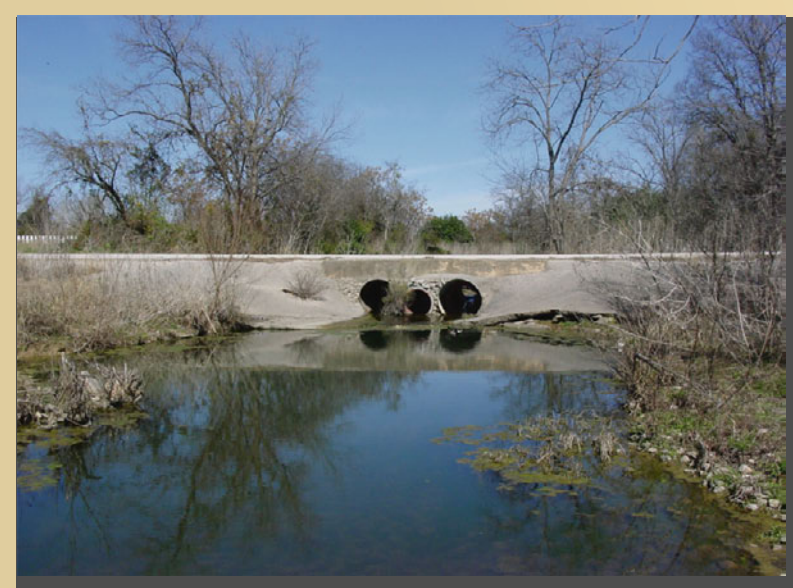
Looking upstream at Yett Street, scour hole approximately 4 feet deep, concrete rip rap failing.
